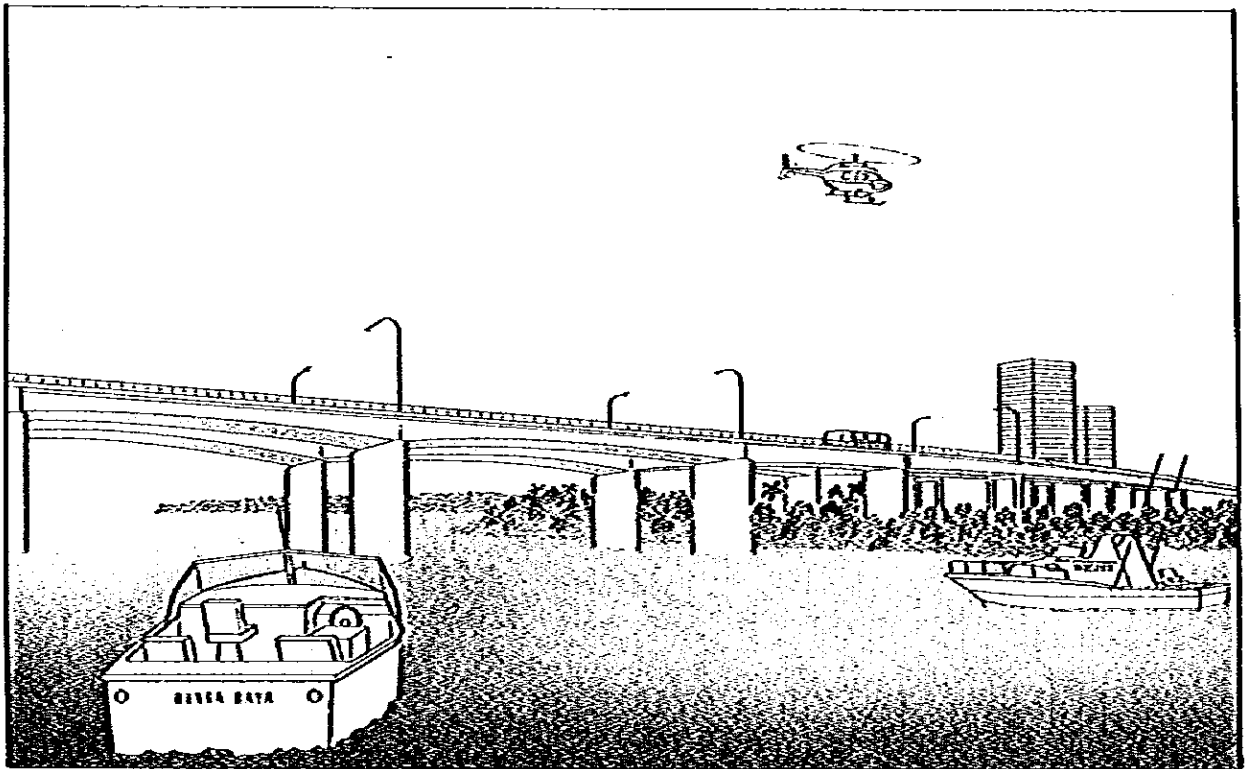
DESIGN IMAGE OF THE TEBRAU BRIDGE
